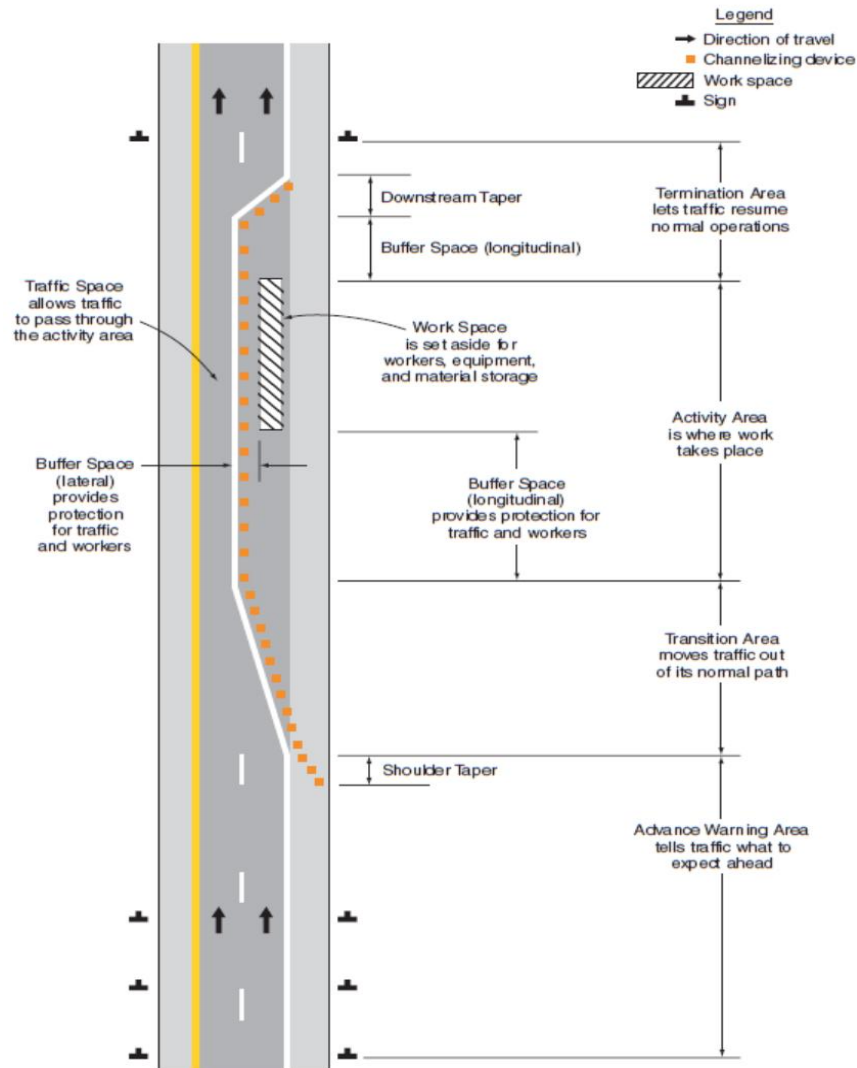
A typical design of TTC for a short section work zone (FHWA, 2009)
